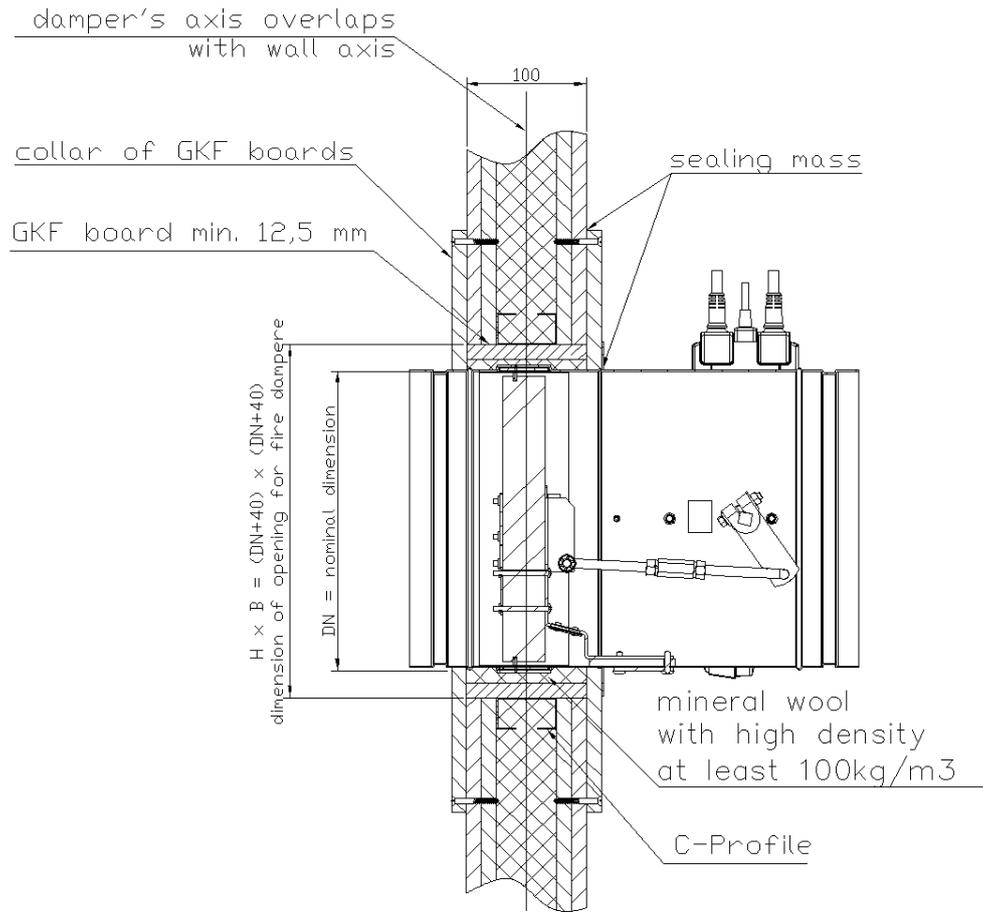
Installation method of fire dampers KTS-O in flexible wall with 100 mm thickness
